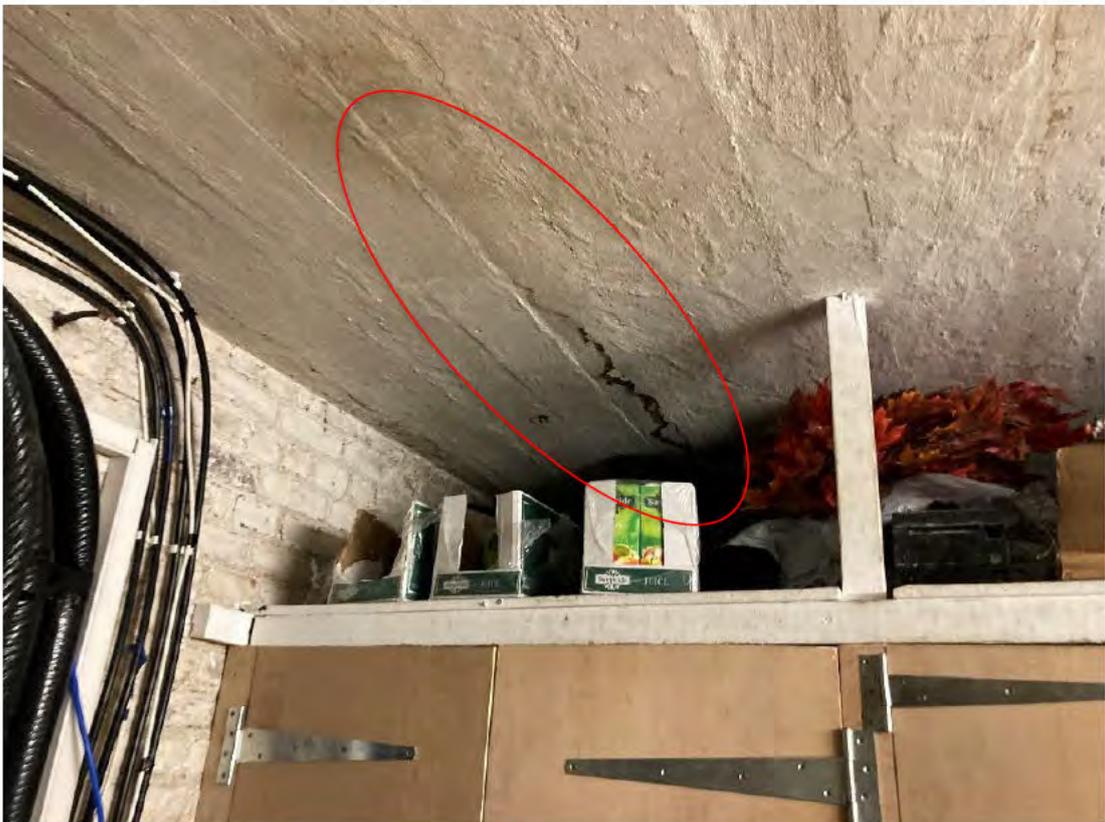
Arch No. 134. Deck soffit presents paint flaking above ceiling panel. Access too constrained to identify associated deterioration, however evidence of water dripping is noted in previous photograph.
